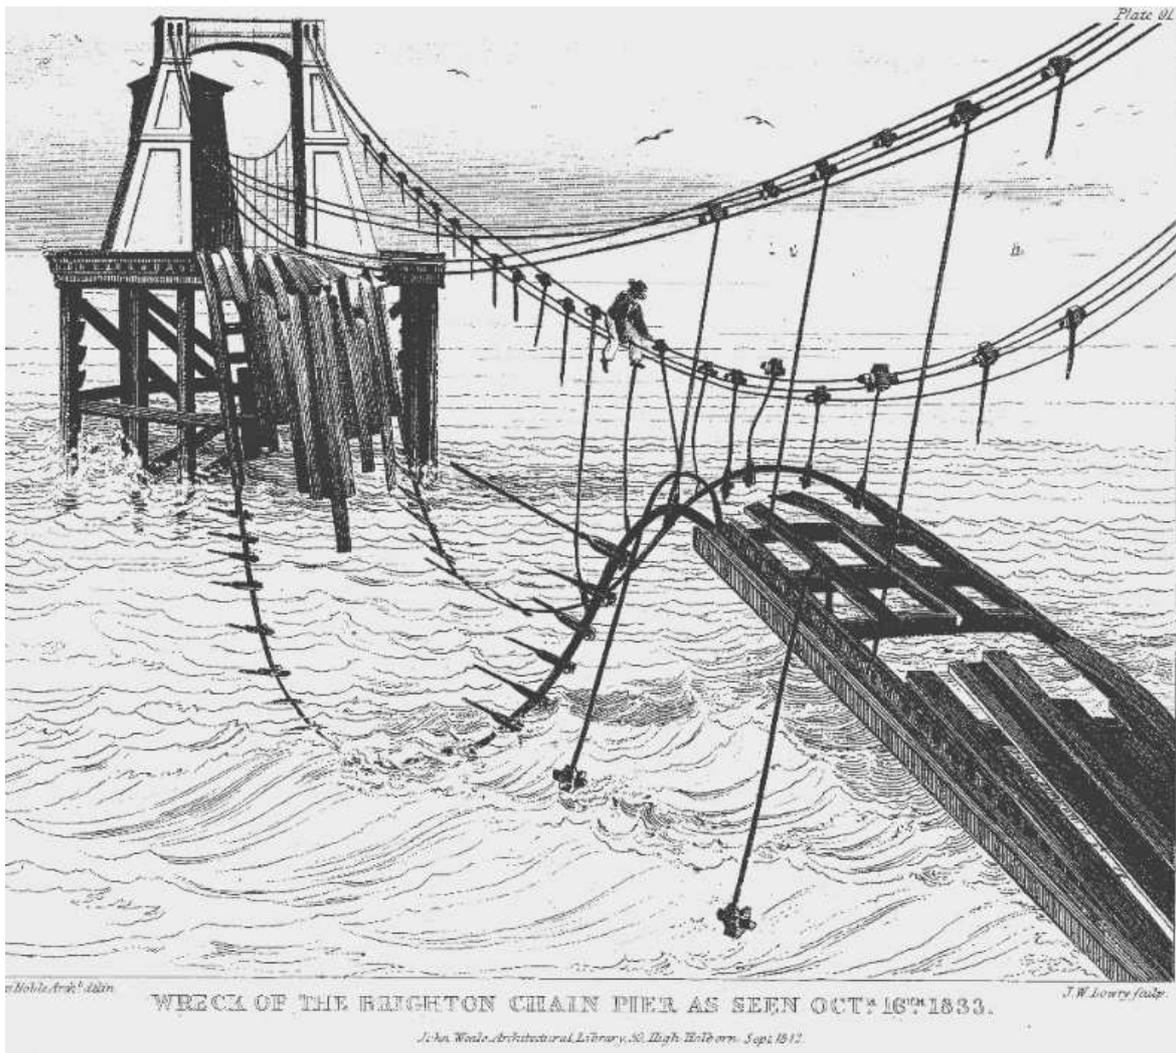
Brighton Pier. Inspection of storm damage in 1833
